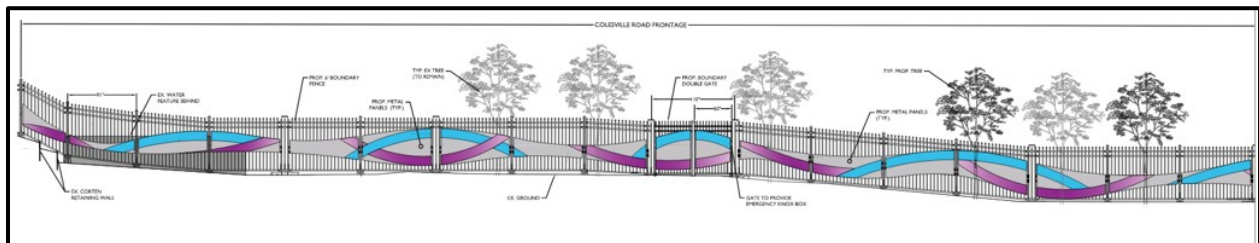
Proposed fence fronting on Colesville Road surrounding Daycare play area
